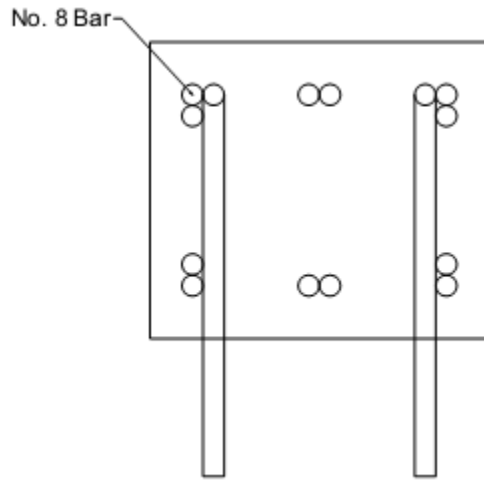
Longitudinal column reinforcement-4 No. 8 bars + 4 No. 11 bars. Transverse reinforcement not shown.
